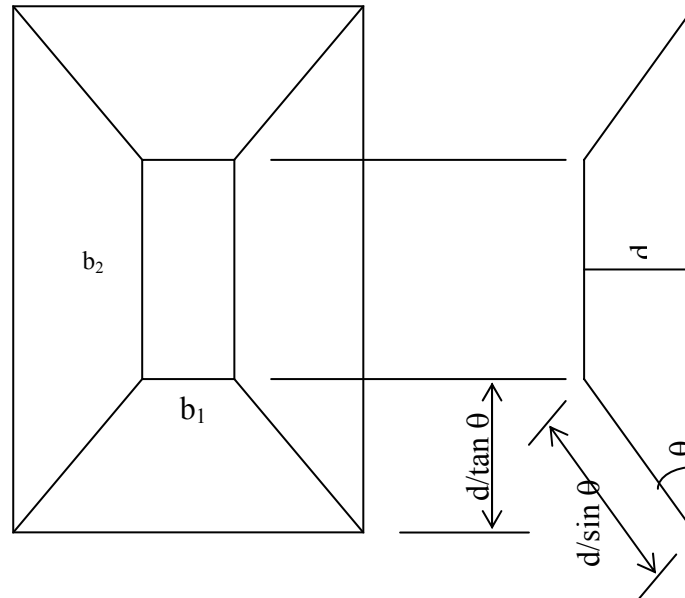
Plan and Sectional View of Failure Angle and Surface for General Model for Punching Shear (Tsui et al. 1986).
